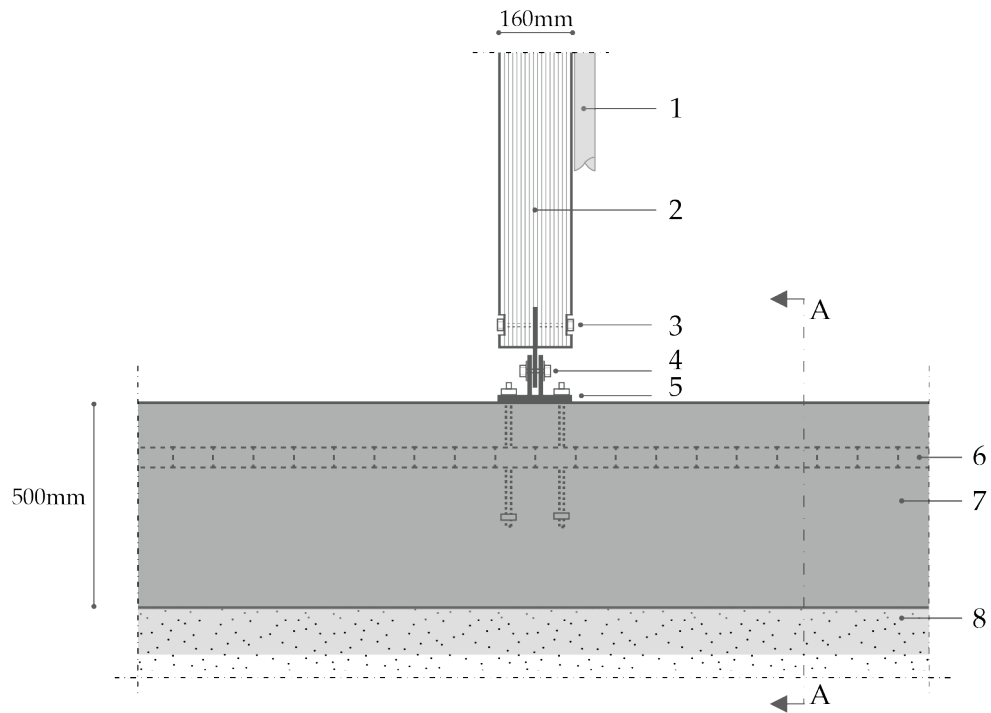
Section B-B of the ground level connection [scale 1:20]
